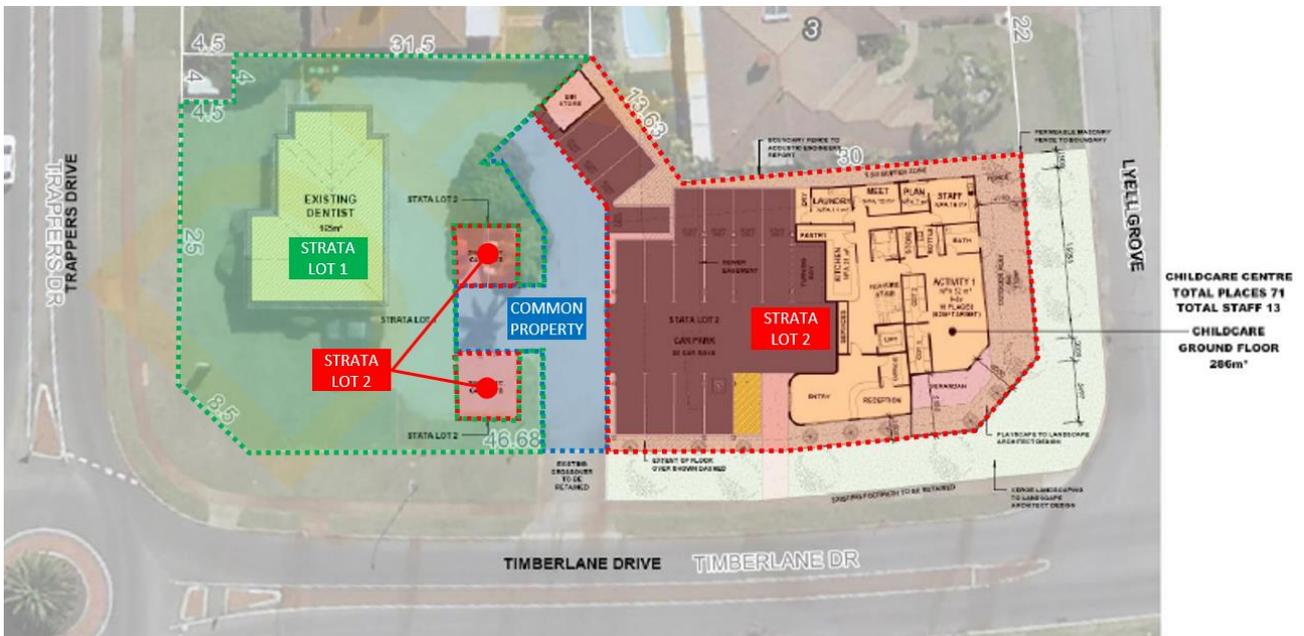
Proposed Site and Ground Floor Plan showing Strata and Common Property Areas
